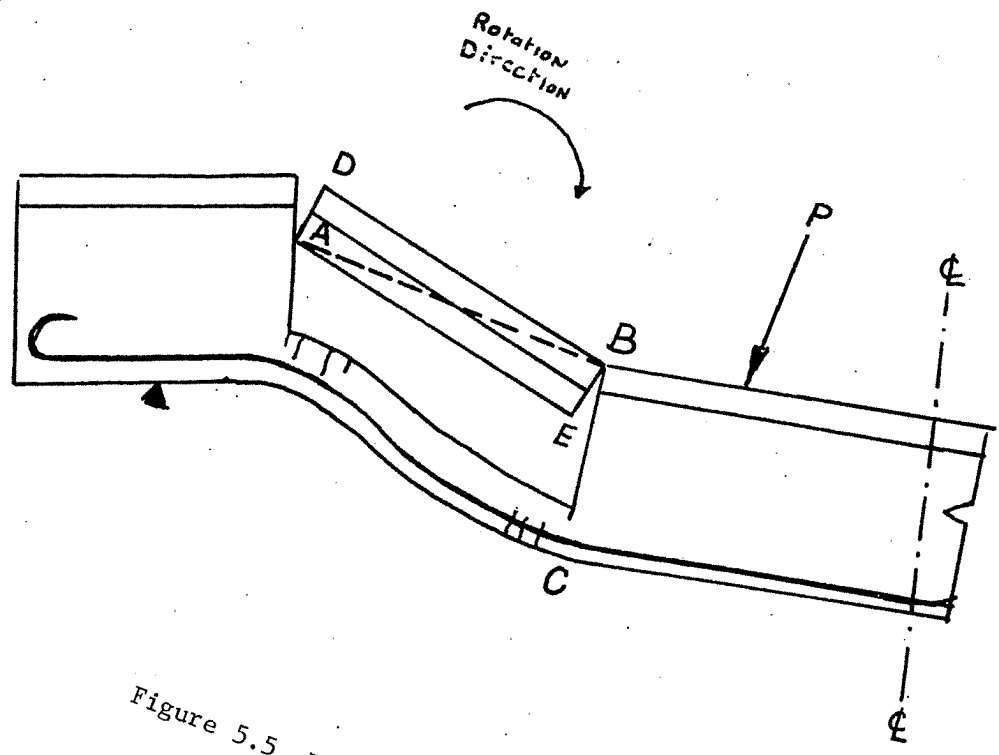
Failure Mechanism of Opening Without Reinforcement.
